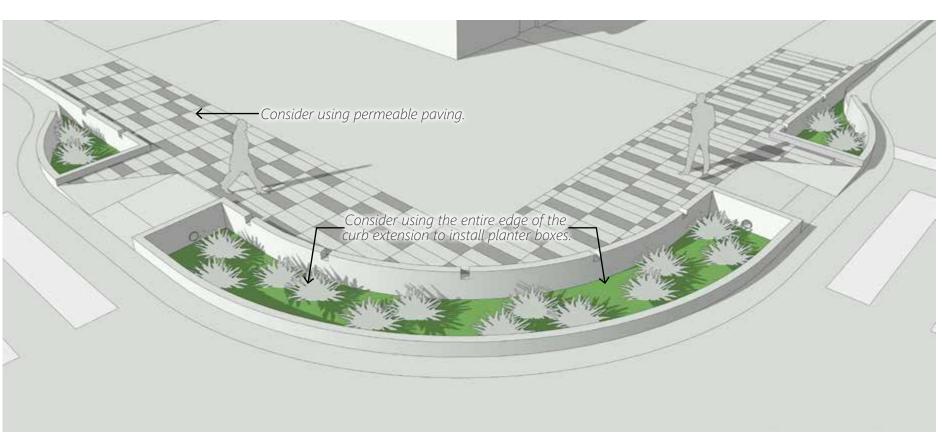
Intersection Corner Curb Extension Planters at a Low-Speed and Volume Street.
